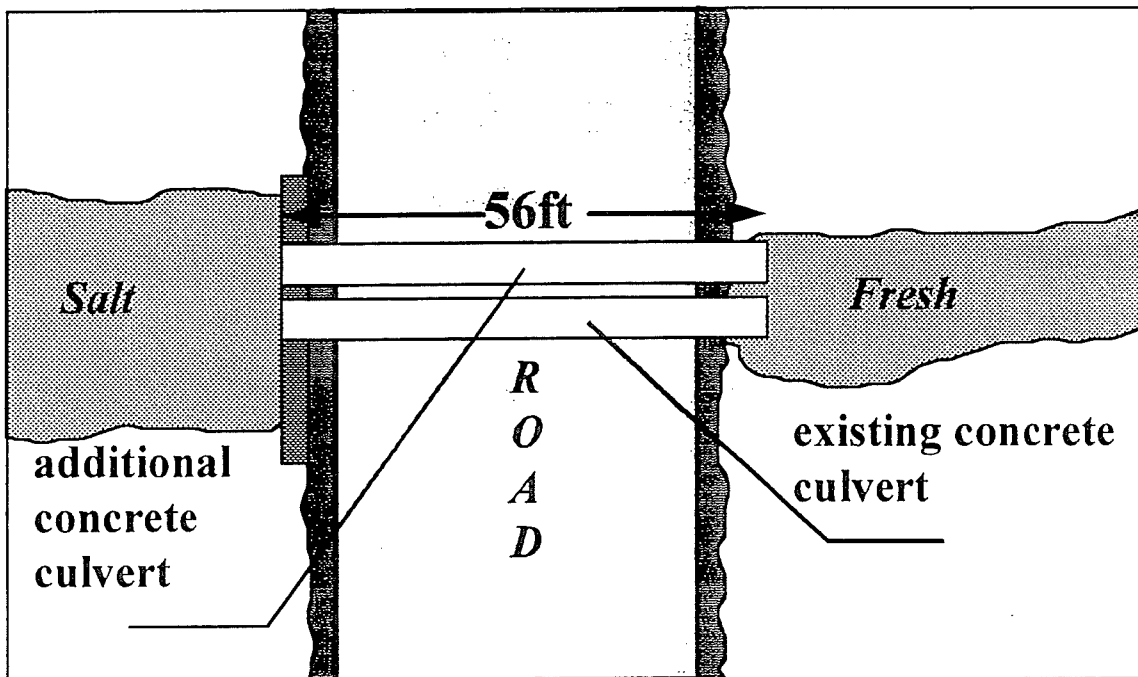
Plan view of Wilders Dike with additional culvert installed parallel to the existing culvert
